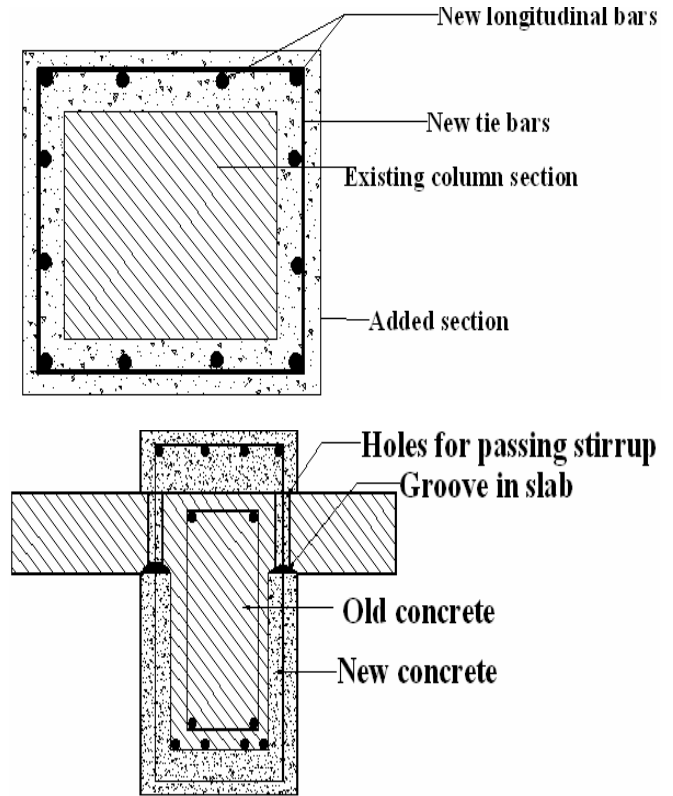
Strengthening Techniques for Existing Non-Engineered RCC Buildings
